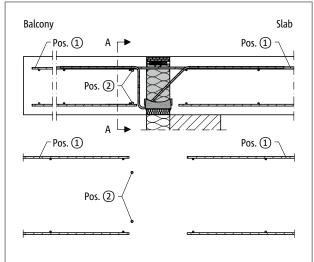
Schöck Isokorb® T type K: On-site reinfircement with direct support
